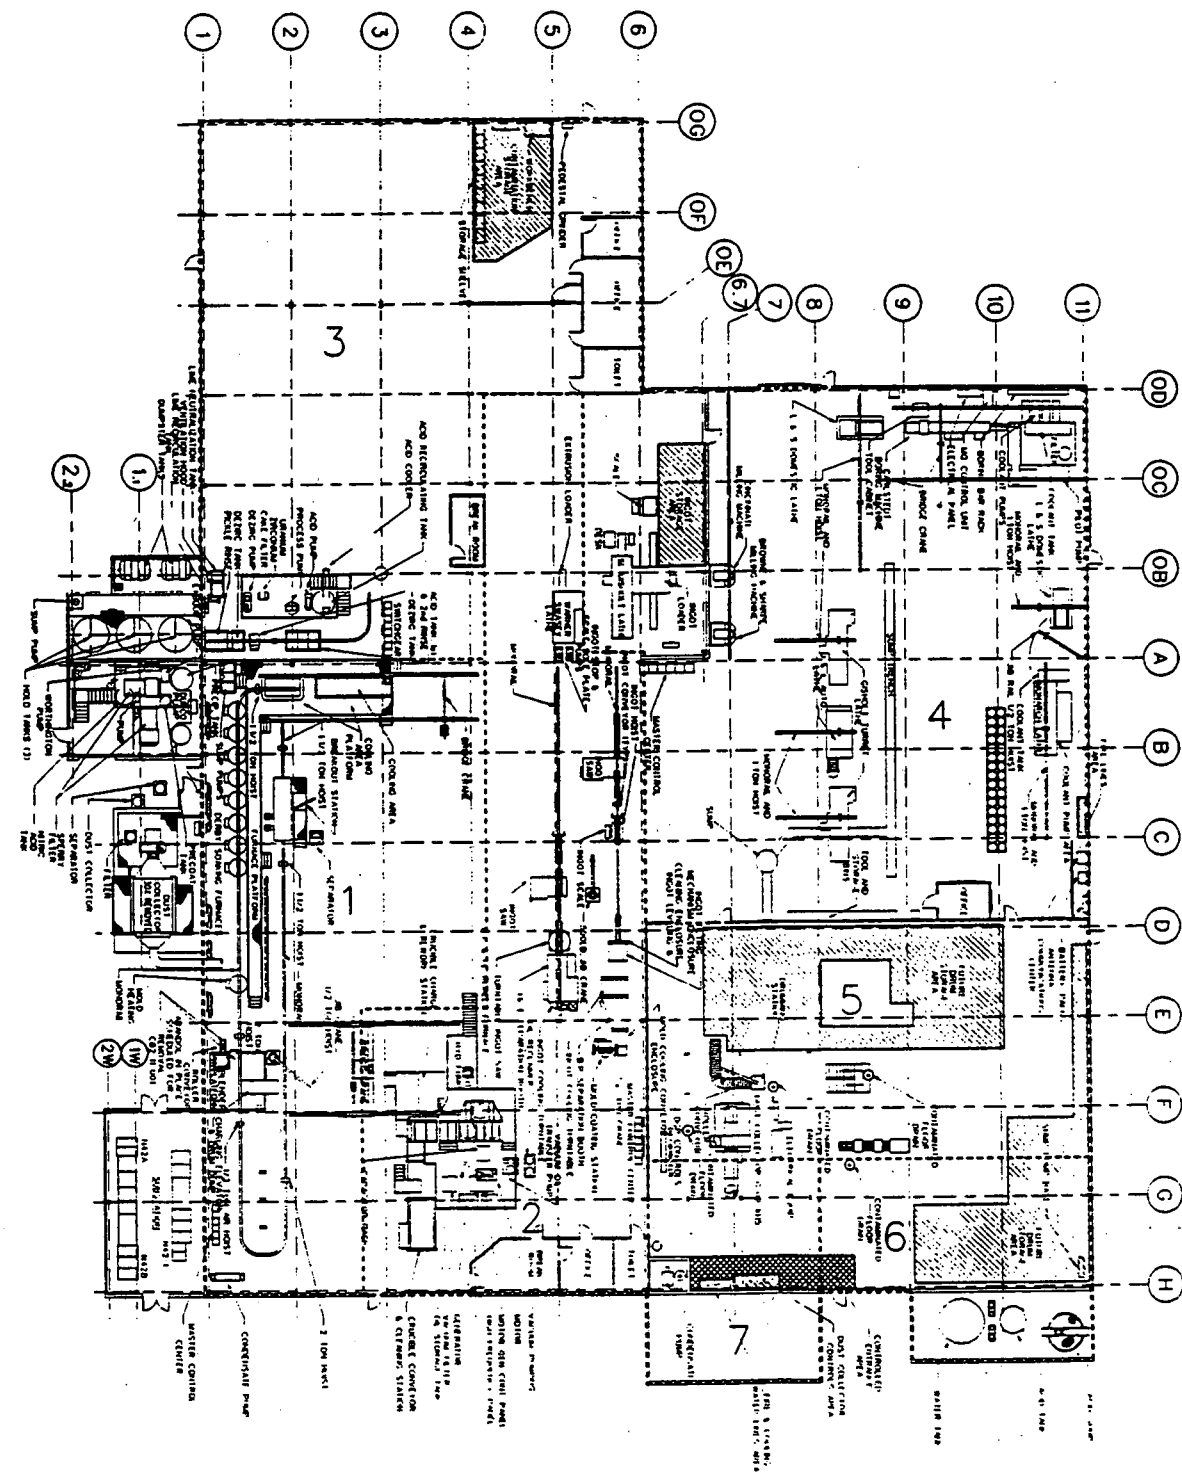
Thorium/Plant 9 Complex - Civil Demolition Plan
